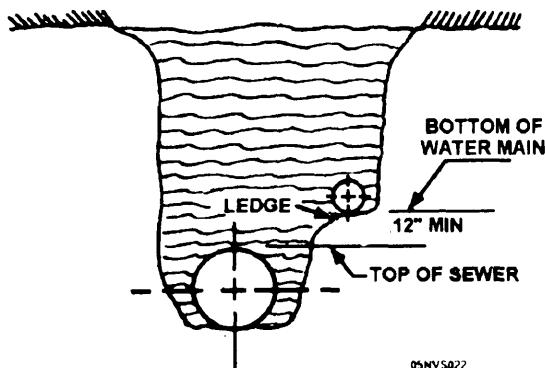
Building sewer and the water-service pipe in the same trench.
